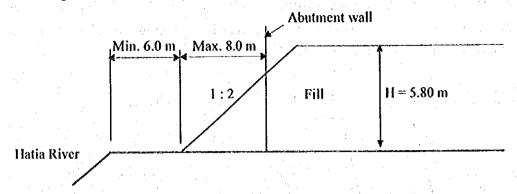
Fill in Longitudinal Direction of Hatia Bridge East Approach
